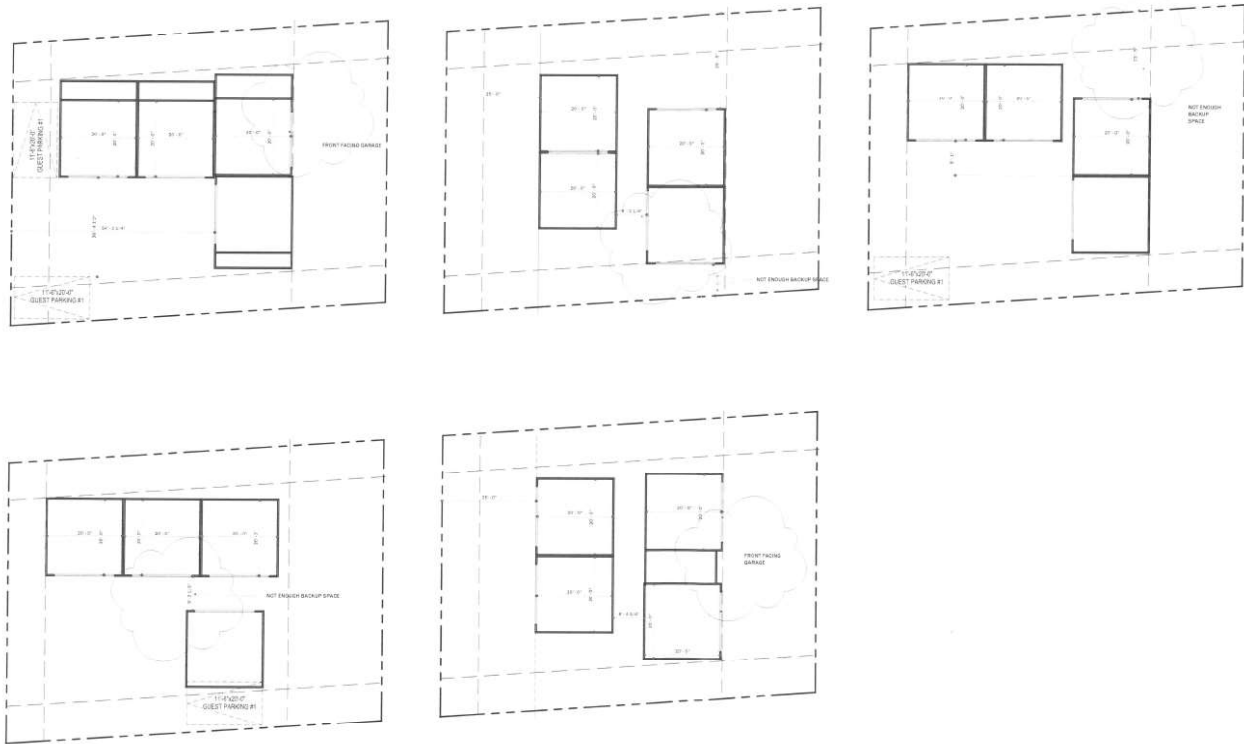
Layout Study showing alternative site layouts considered by the Applicant
